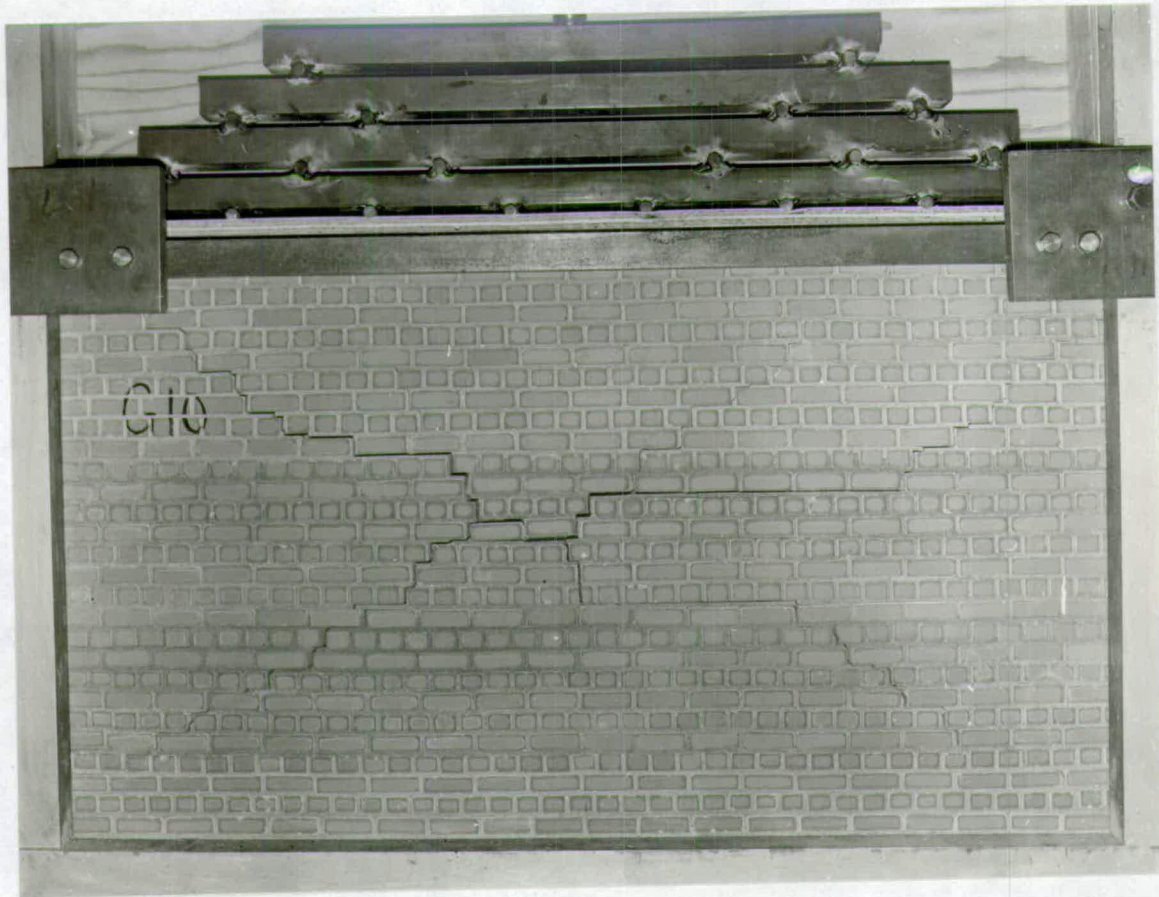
FAILURE OF WALL G10 - 4 SIDES SUPPORTED
